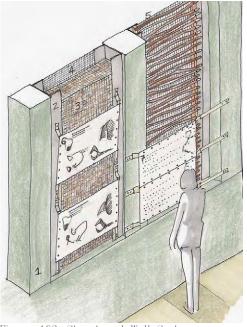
Structured Wall Systems. Welded mesh stone-filled baskets are fixed to steel columns and concrete columns (see section 7, drawings A1 and 2).
